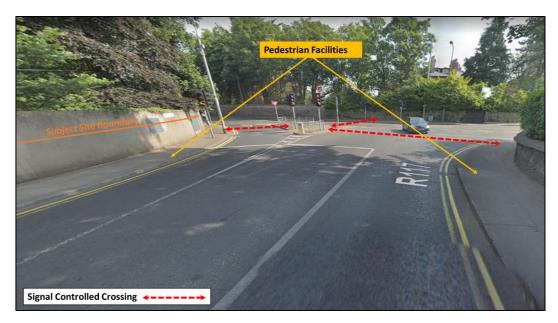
Existing Pedestrian Facilities along Milltown Road
